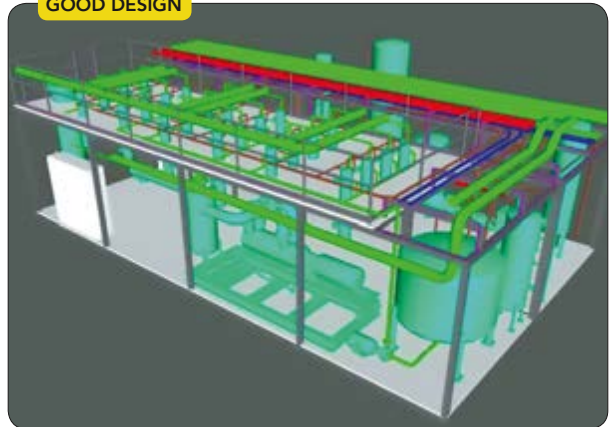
Running piping in streamlined racks, installing equipment on the skid's outer edge, and providing a center aisle enhance accessibility for maintenance.
